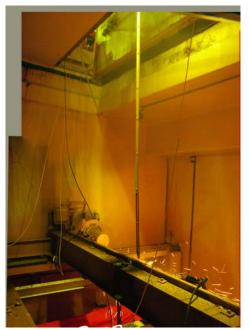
Oxy-gasoline Torch Used to Size-Reduce a Crane.
